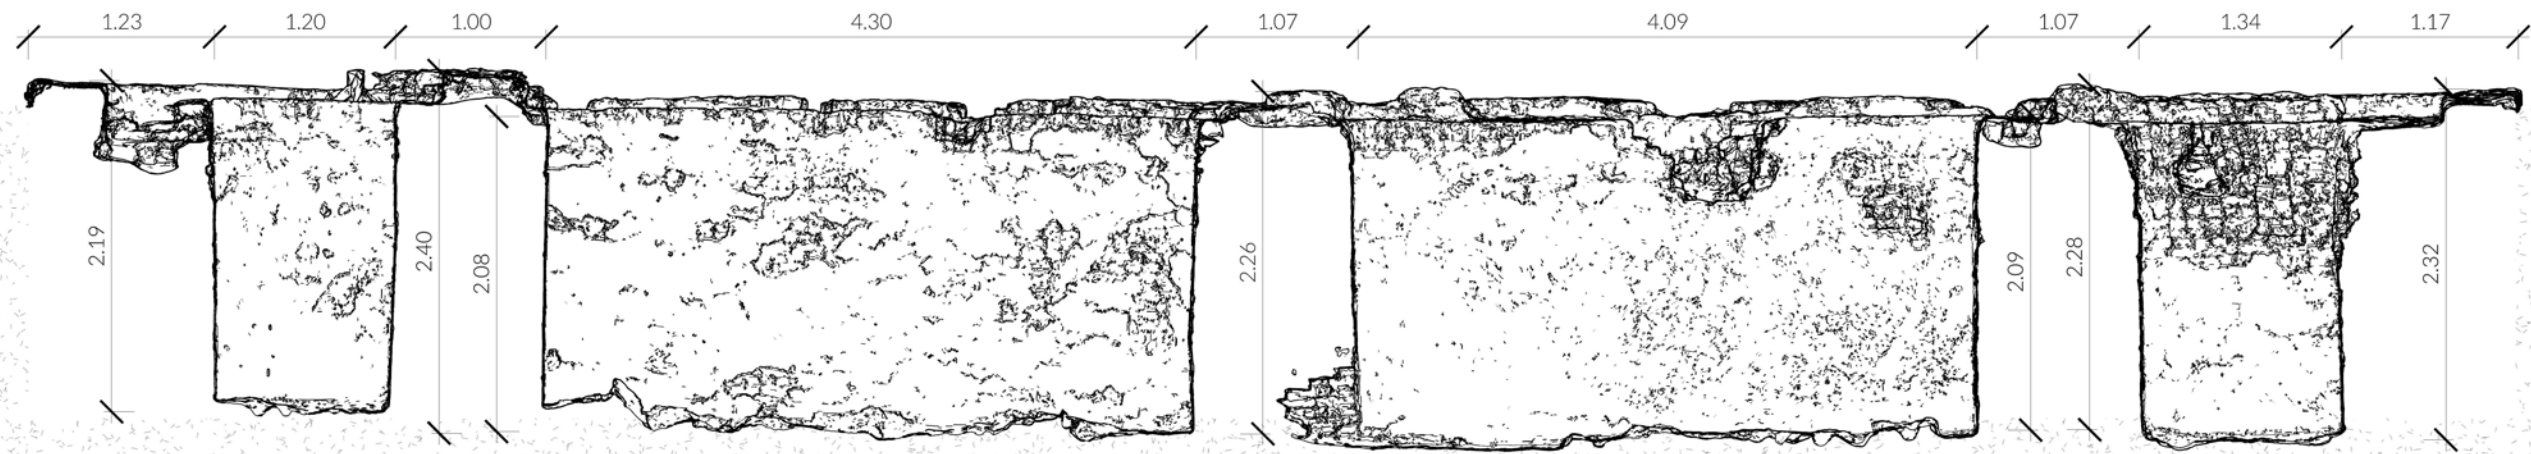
Section through YKK6 - YKK7 - YKK8 - YKK1, south walls, 1:50
